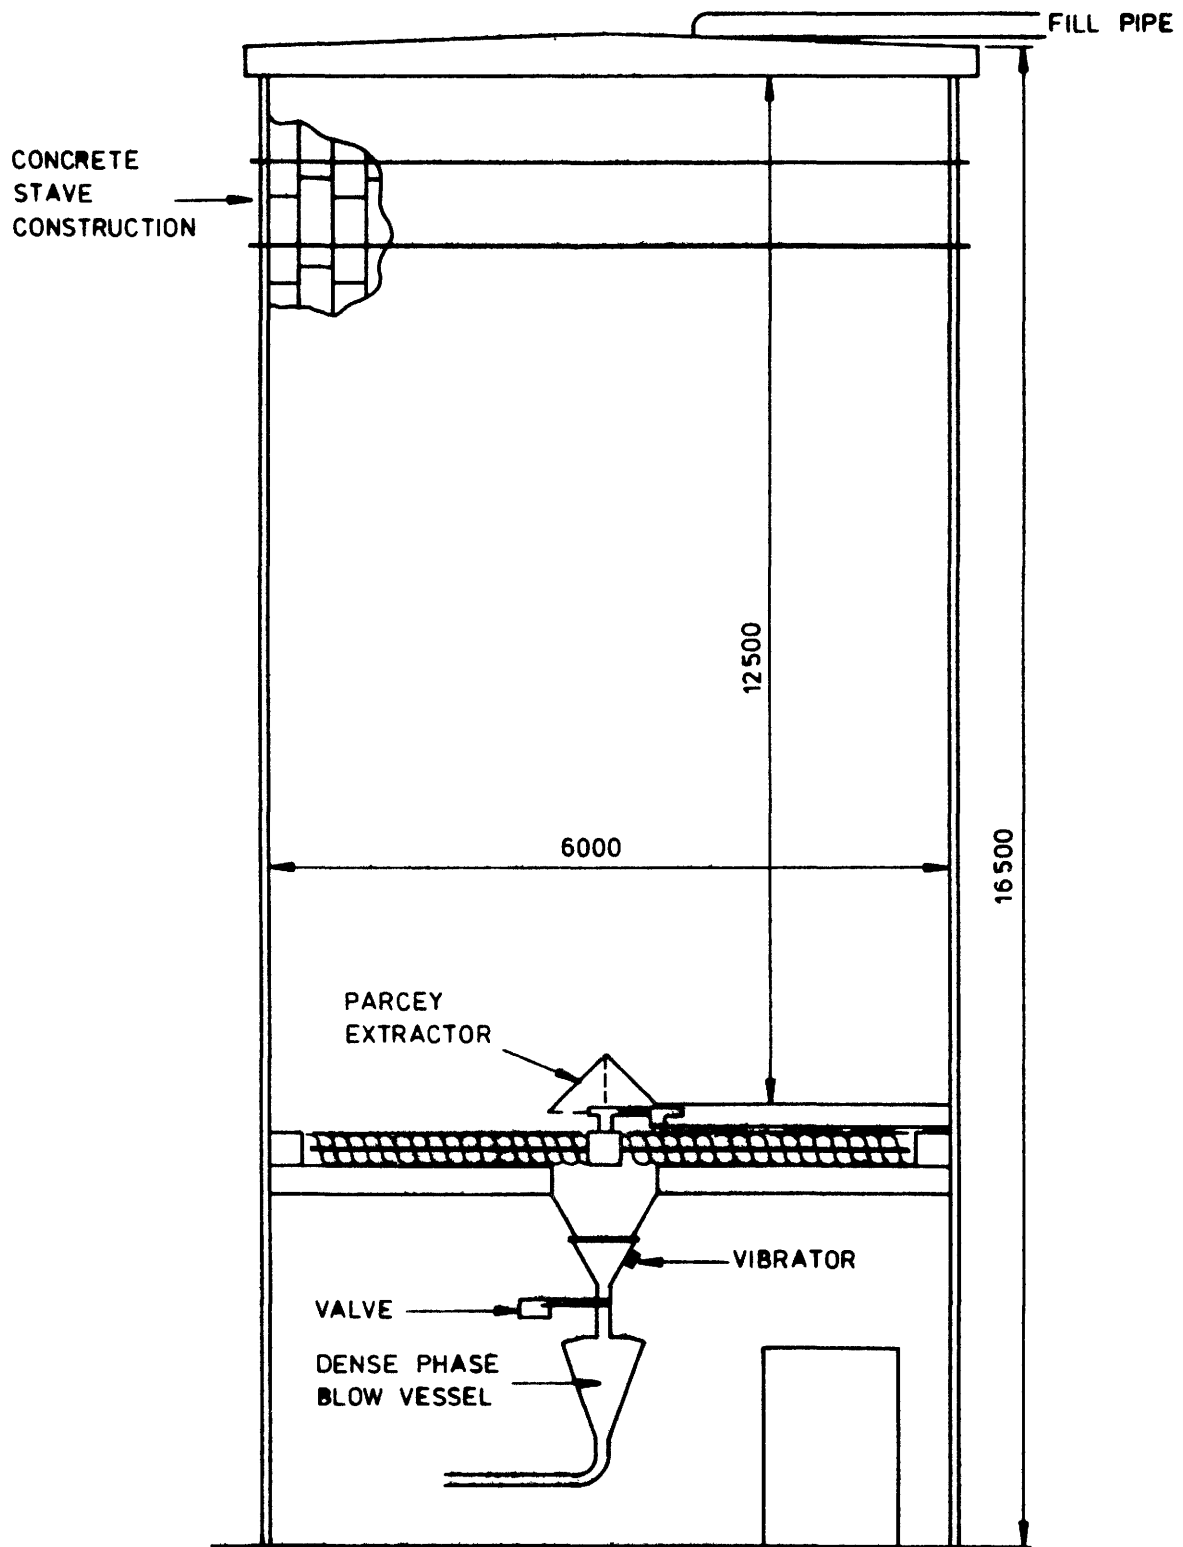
250 TONNE CAPACITY CONCRETE STAVE SILO
